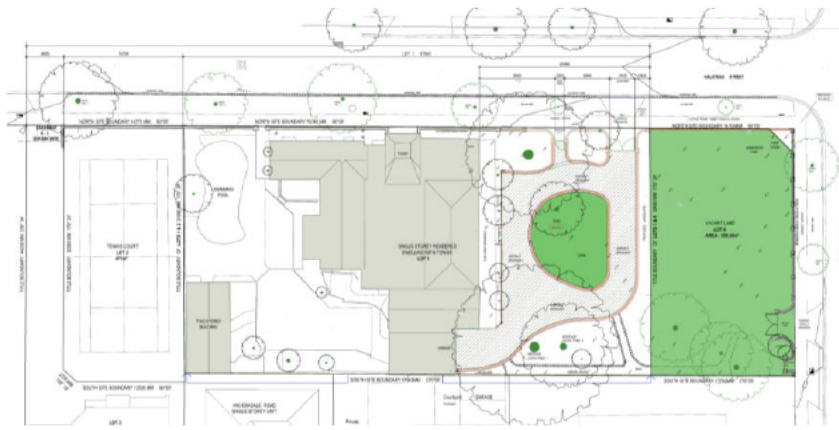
The proposed plan prepared by Andrew L Straube. Rev. C, 26/10/2023.
